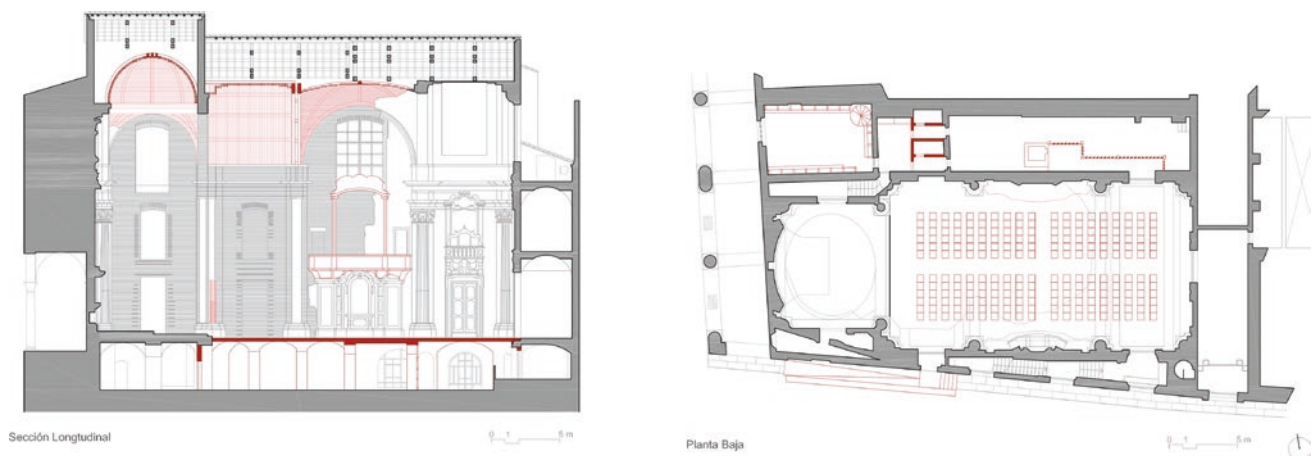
Longitudinal section and ground floor plan. Red lines stand for the new intervention. Author's own, 2013
